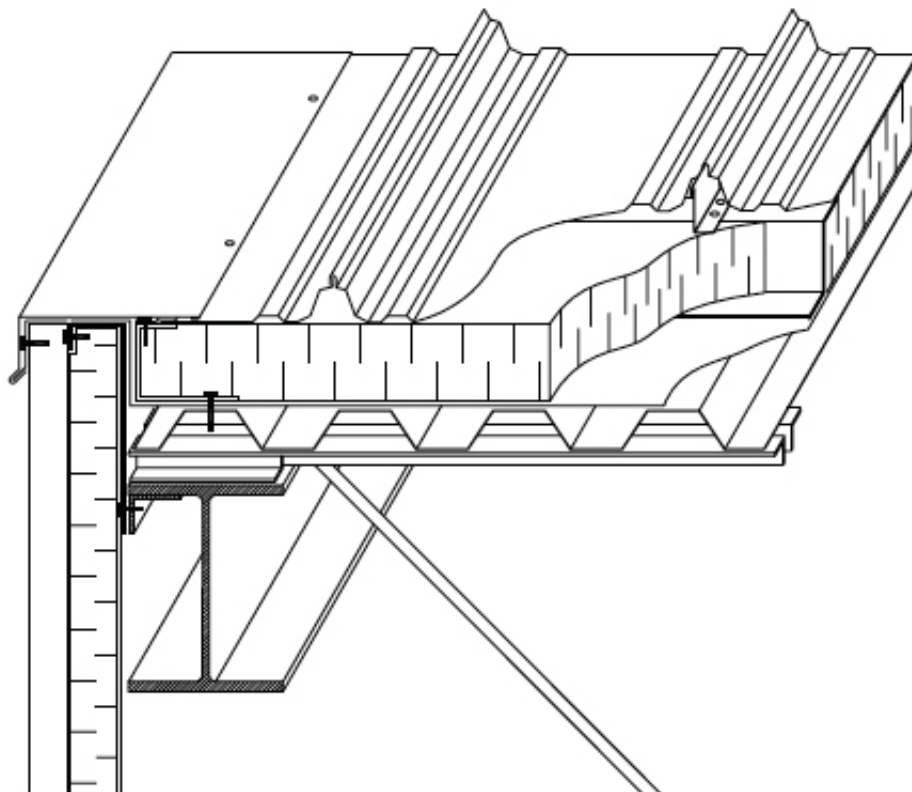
A: Gable End - Insulated Sheet Steel WallInstallation/Assembly Notes:
